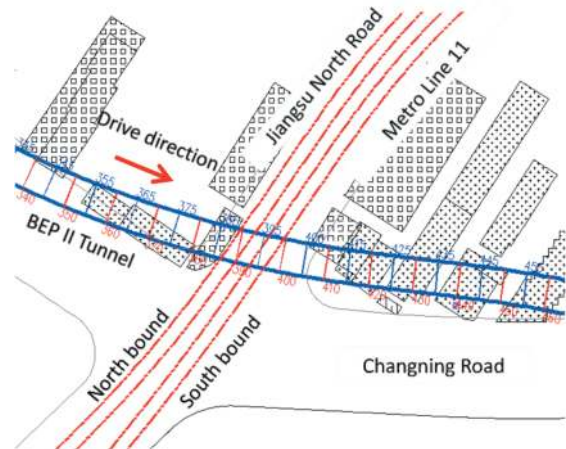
Plane of BEP tunnel and metro line 11 intersection.
